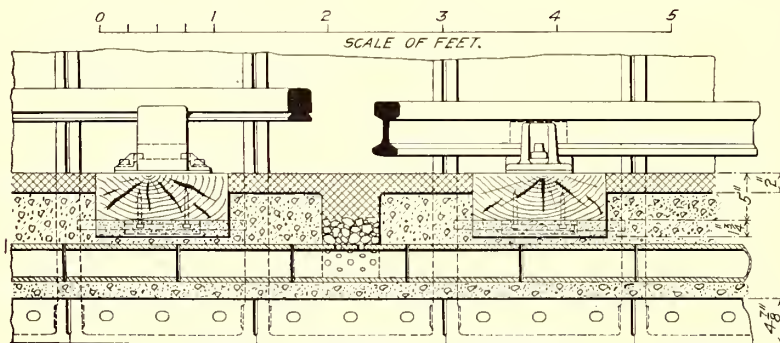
PLANS, SECTIONS AND SIDE ELEVATIONS, ILLUSTRATING TYPE OF CONSTRUCTION OF PERMANENT WAY
